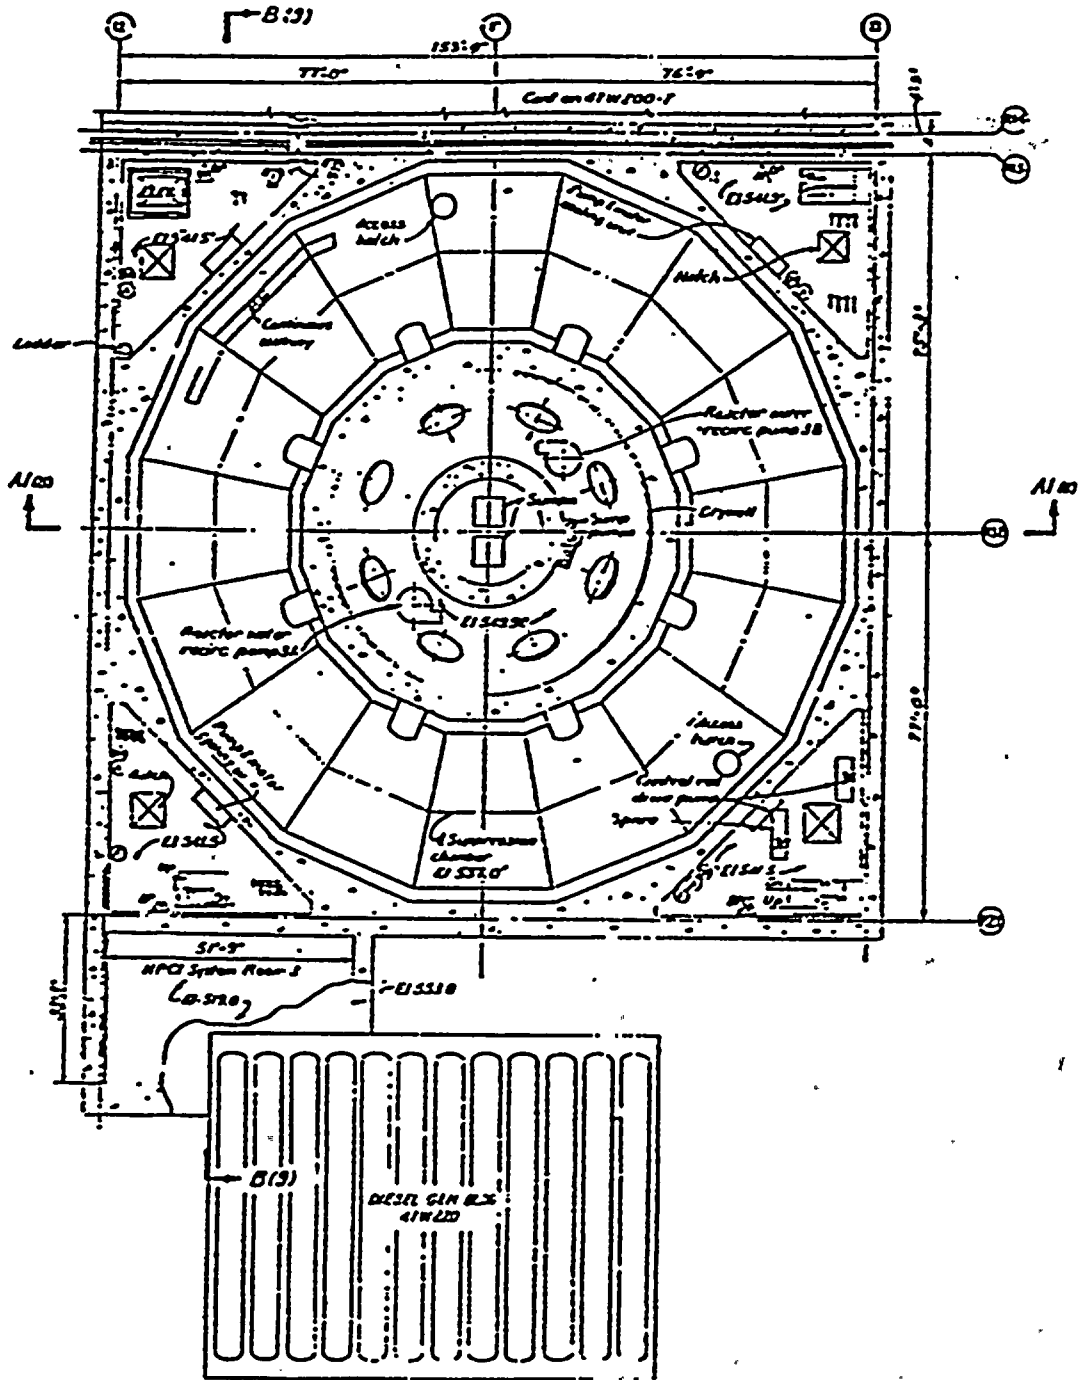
(Page 2 of 2). Reactor Building, Elevation 541'
